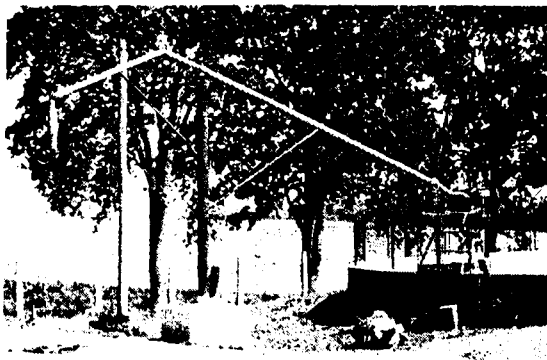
Filling and empty equipment of concrete silo sunk in the soil
